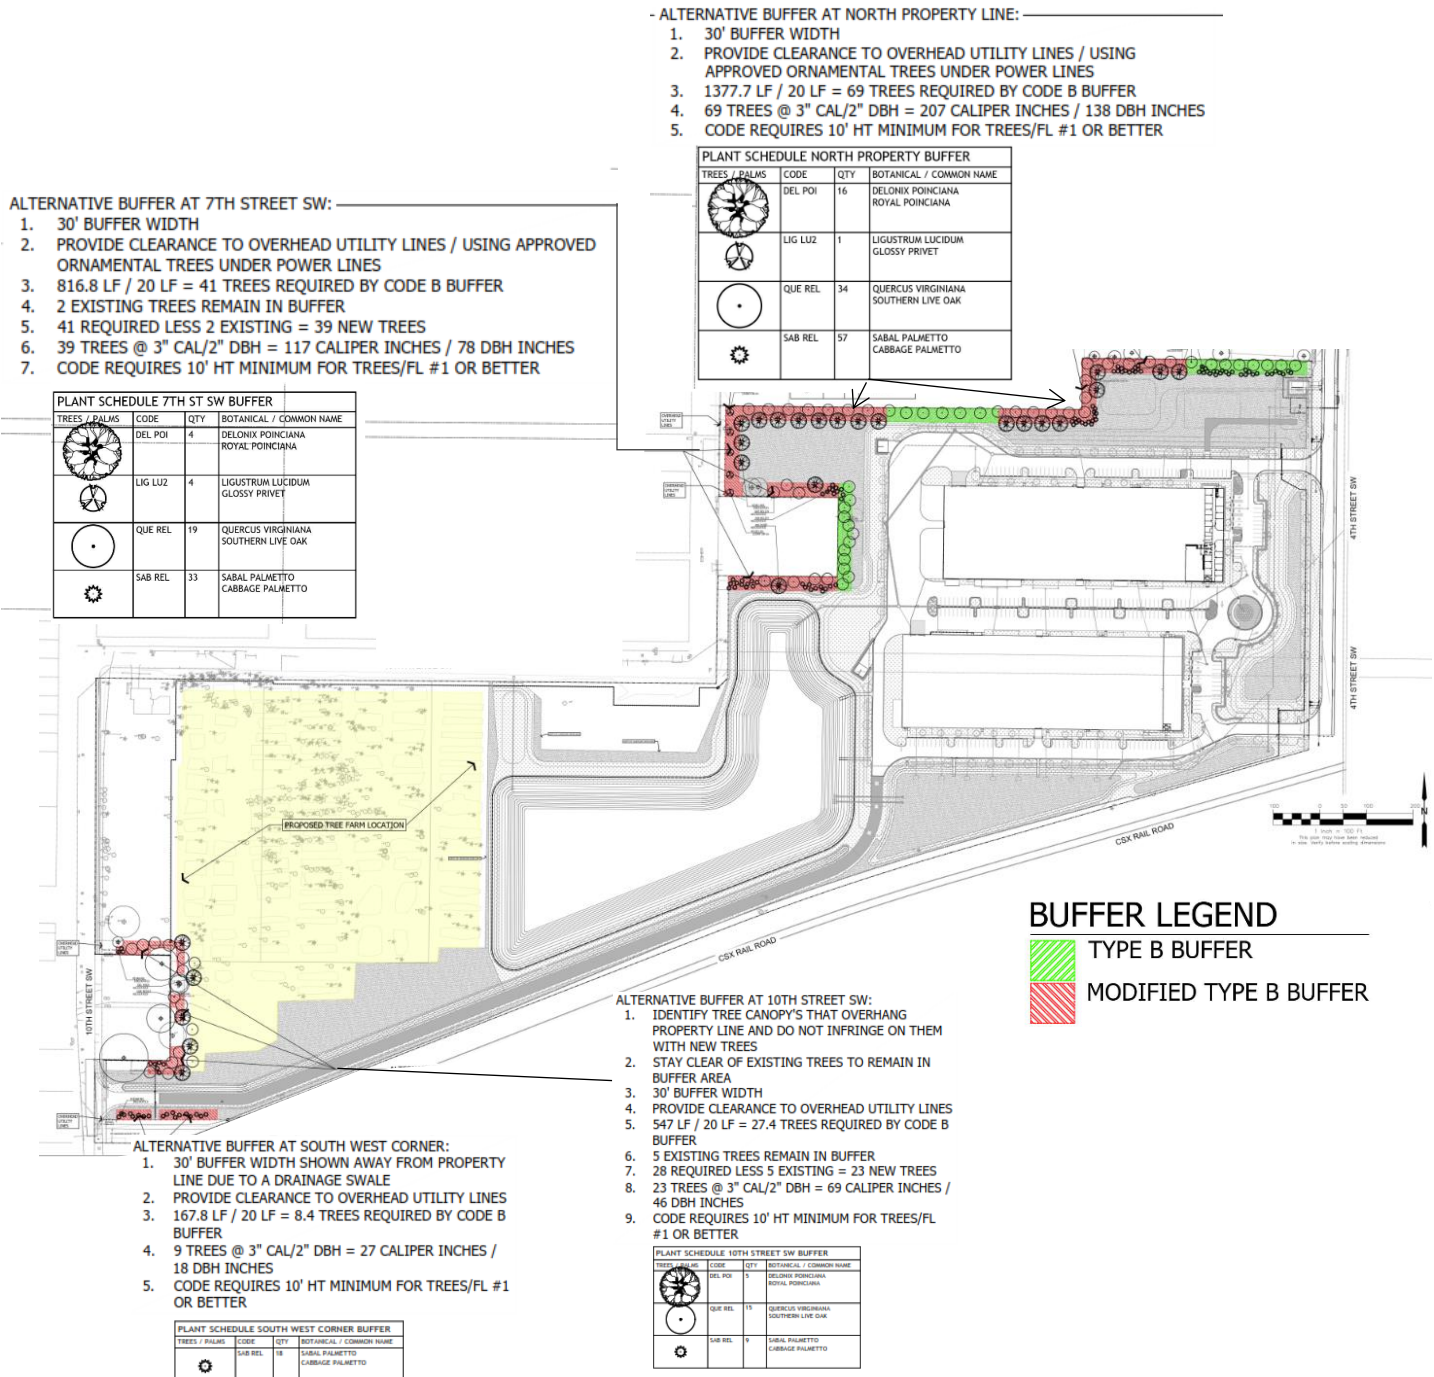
Sheet 2 of 2 PD Plan – BUFFERS - PROPOSED PLANTINGS AND LOCATION
